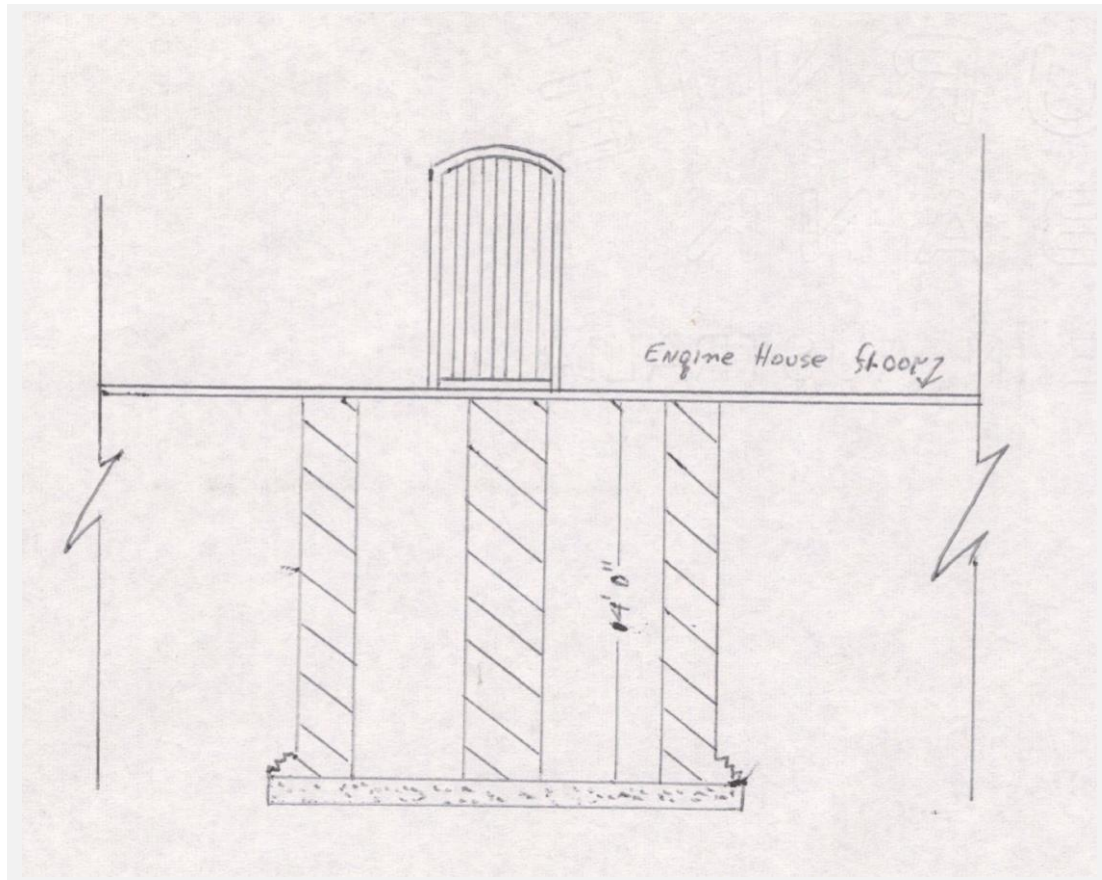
Hand-drawn section demonstrating engine-house pit depth. Image source: Harding 1966: 6
